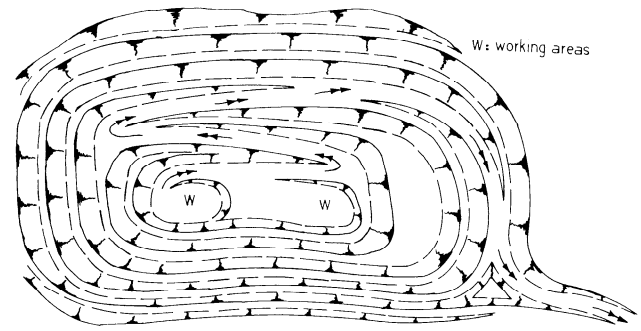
Diagrammatic open pit layout with switchback haul road. W = working areas
